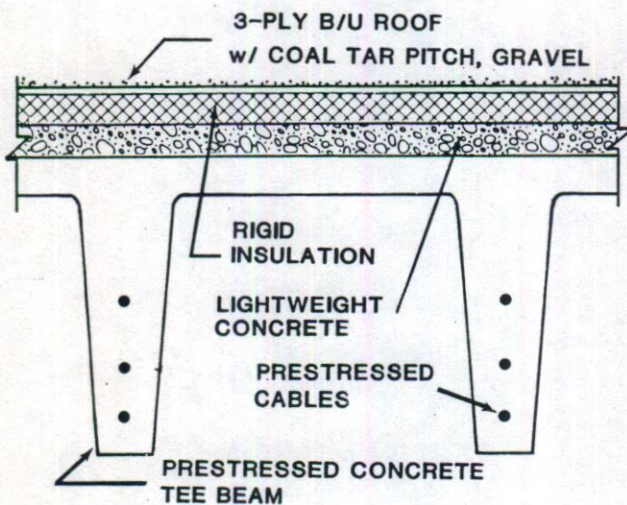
Type 1—Prestressed Concrete Tee-Beam Construction
